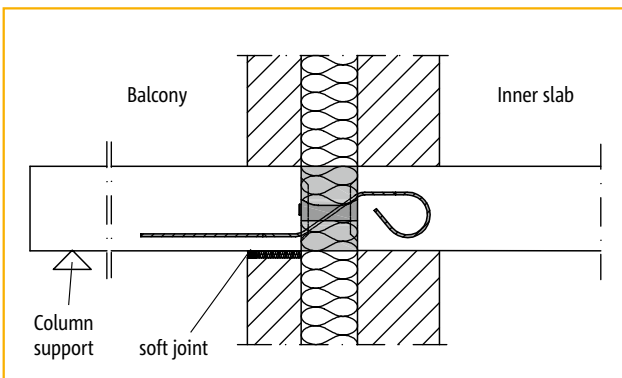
Single-leaf brickwork with a balcony at inner slab level
